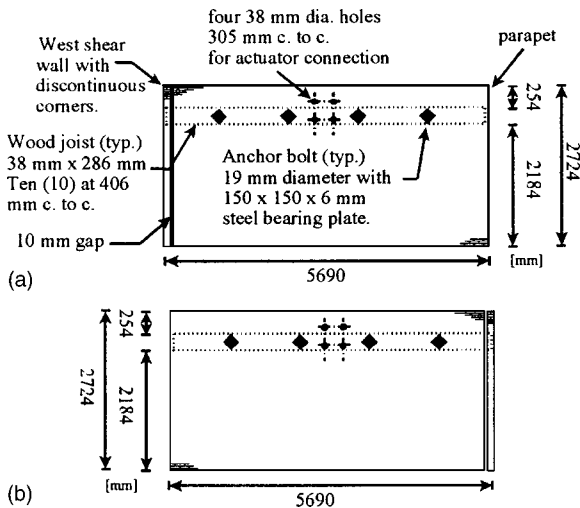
Elevation of unreinforced masonry specimen (normal to loading): (a) south wall and (b) north wall
